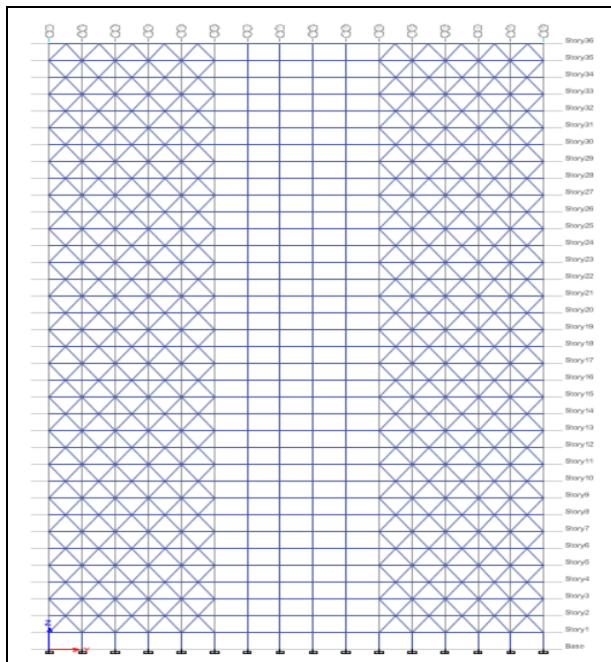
Elevation of model-2, with Diagrid connection between two stories.
